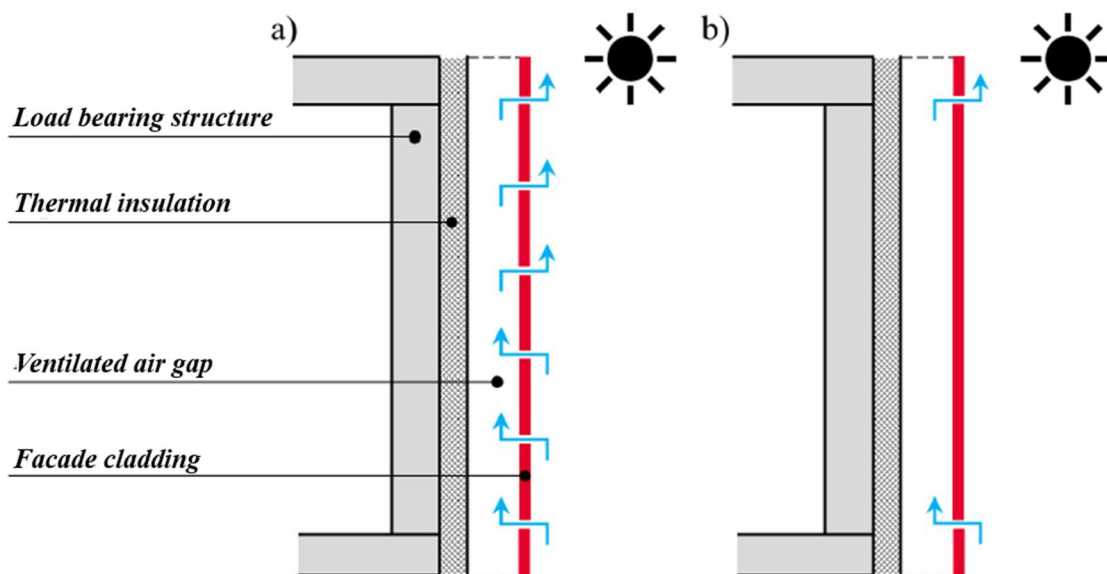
External cladding: a) open system – noncontinuous façade area; b) closed system – continuous façade area [1], [18].
